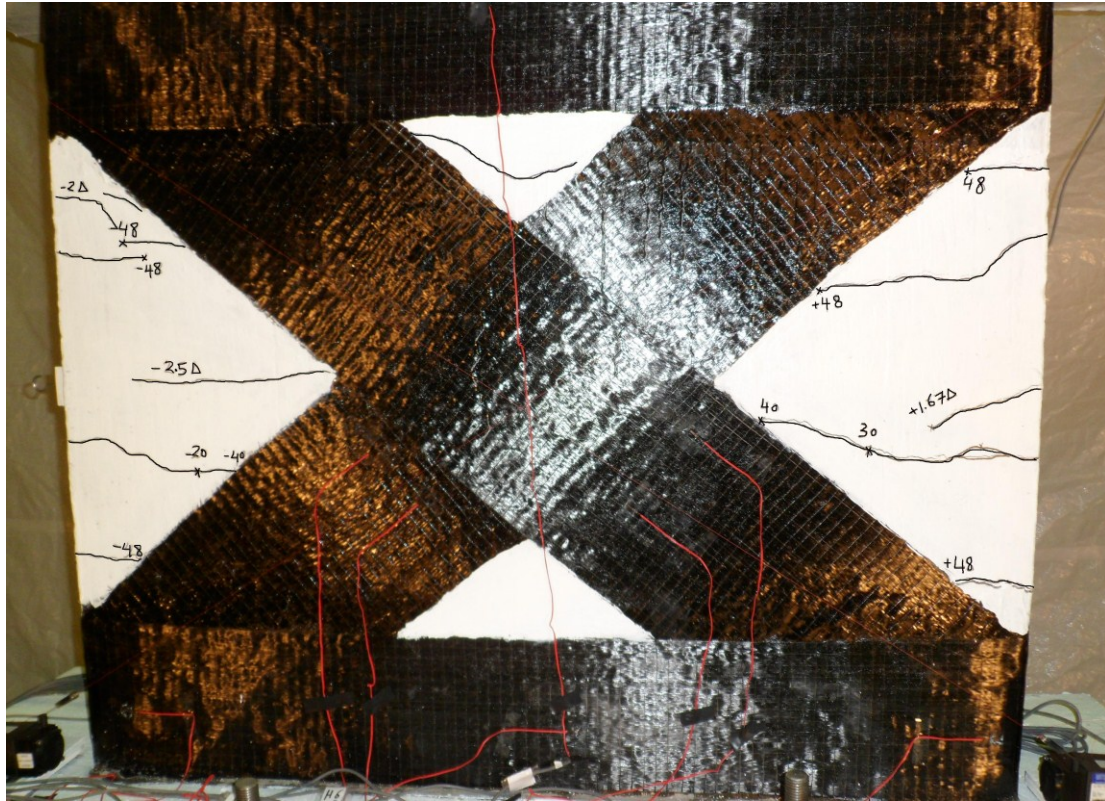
Crack pattern of the FRP-retrofitted wall RW2.
